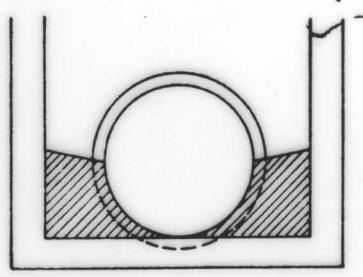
DETAIL OF BOTTOM CONSTRUCTION WHEN INLET SERVES AS MANHOLE
